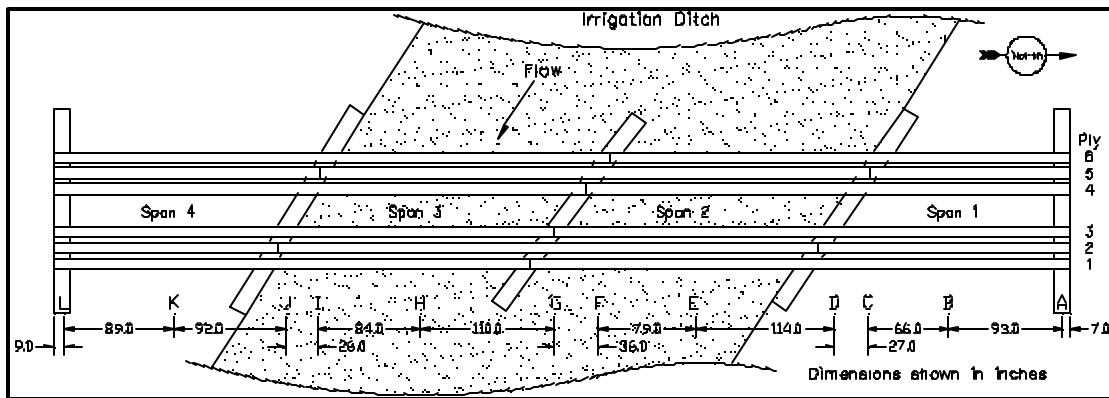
Schematic of Bridge 32.56, four spans over irrigation ditch with skewed abutments
